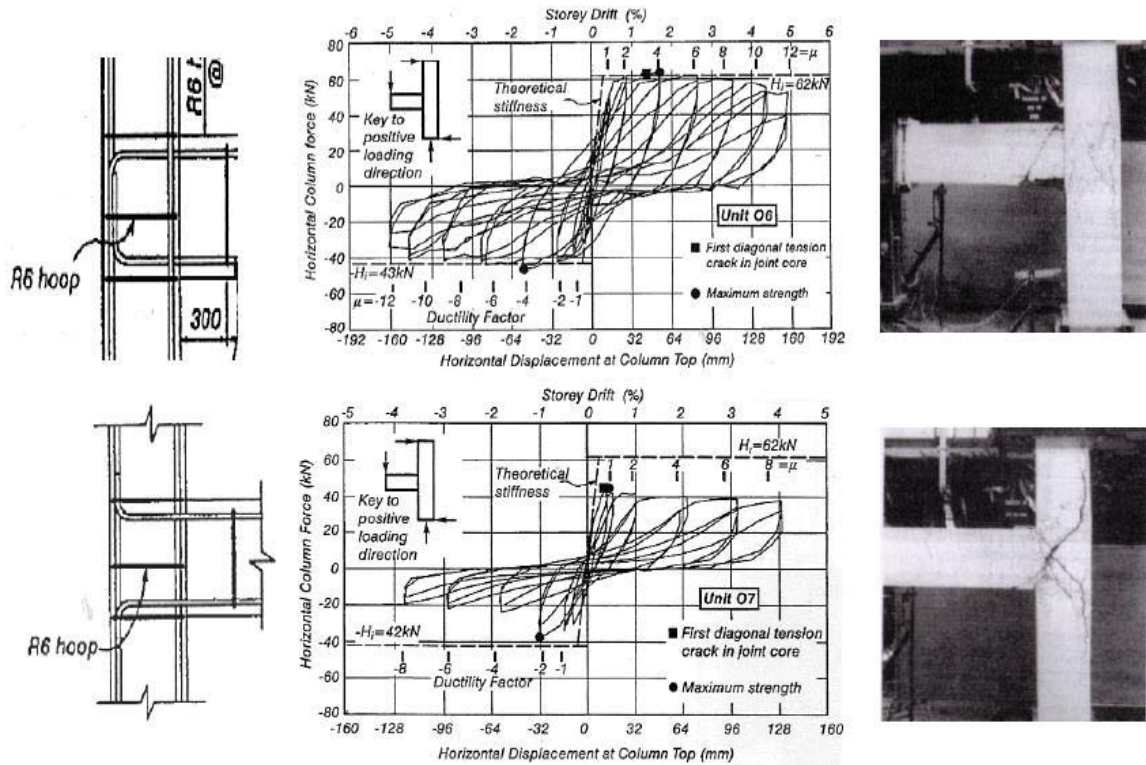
Reinforcement details, hysteresis curve and failure modes of specimens [3]
